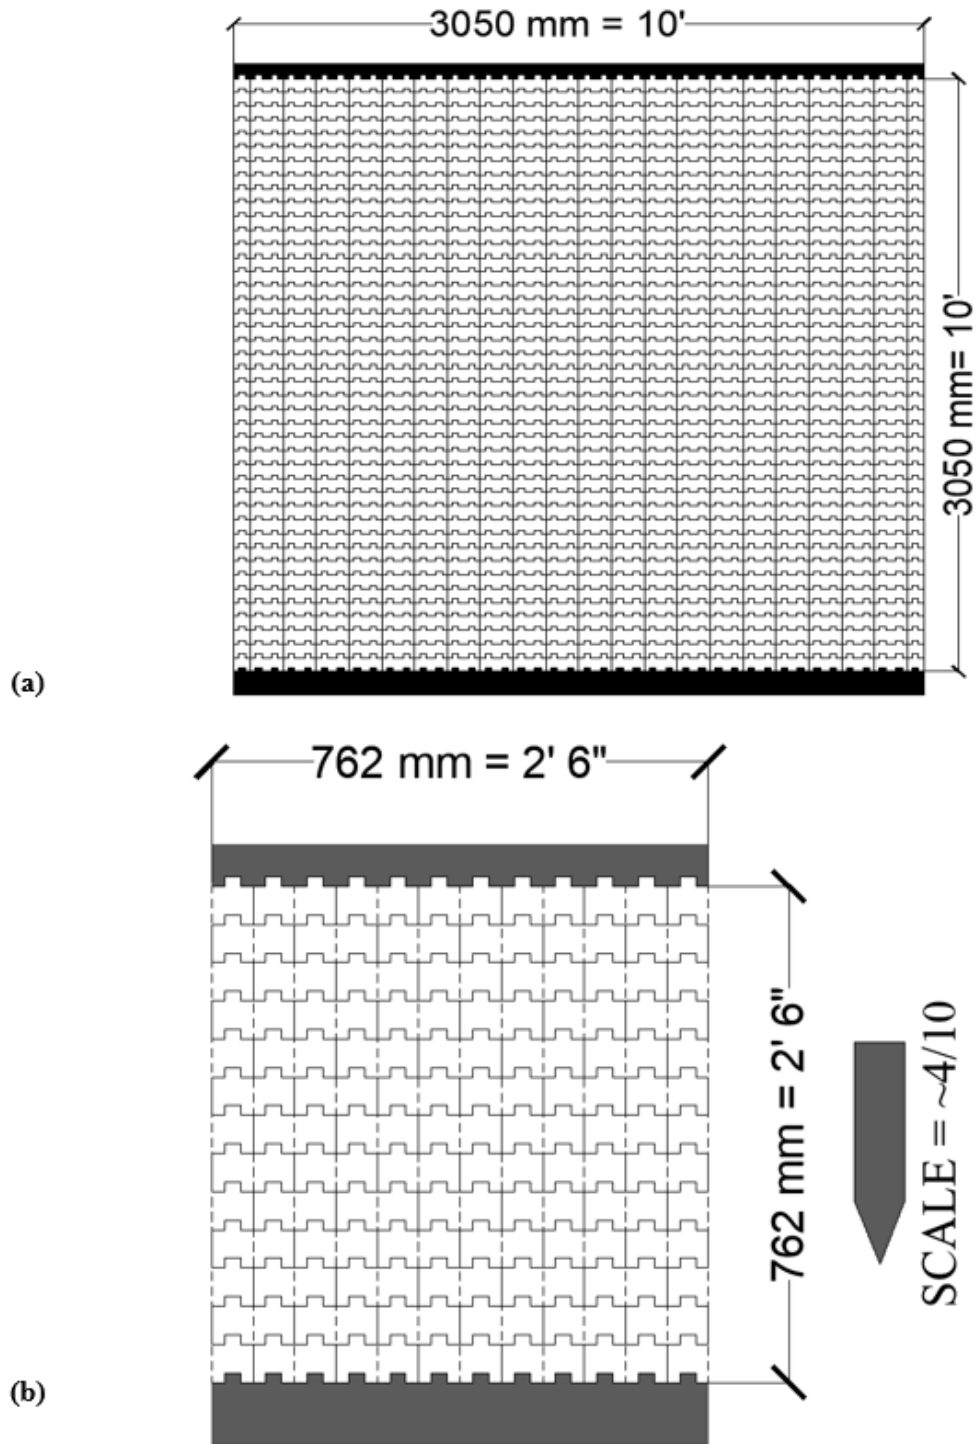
a) Proposed actual wall, and b) scaled down prototype wall for current work
